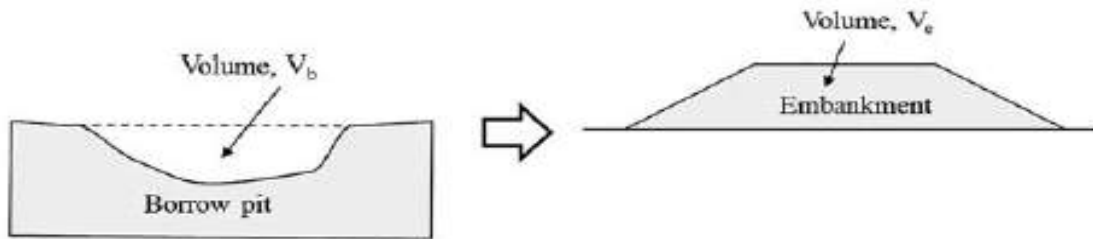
Borrow pit and embankment for Problem 3.3.
